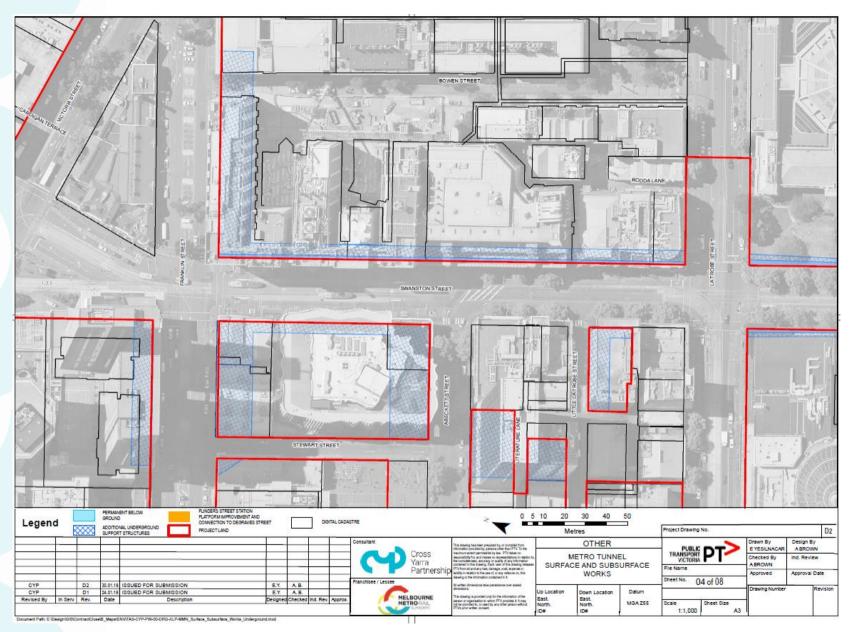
ADDITIONAL PROJECT LAND REQUIRED FOR UNDERGROUND SUPPORT STRUCTURES AND PERMANENT BELOW GROUND AT CBD NORTH STATION
